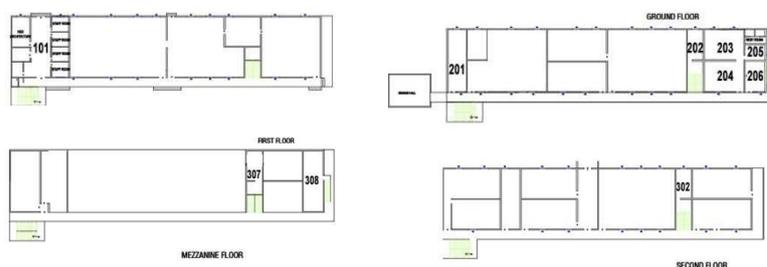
Floor plans showing staffrooms, Dept. of Architecture, TKMCE
